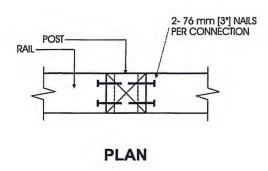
Exterior Connection: Top Rail Nailed to Post
